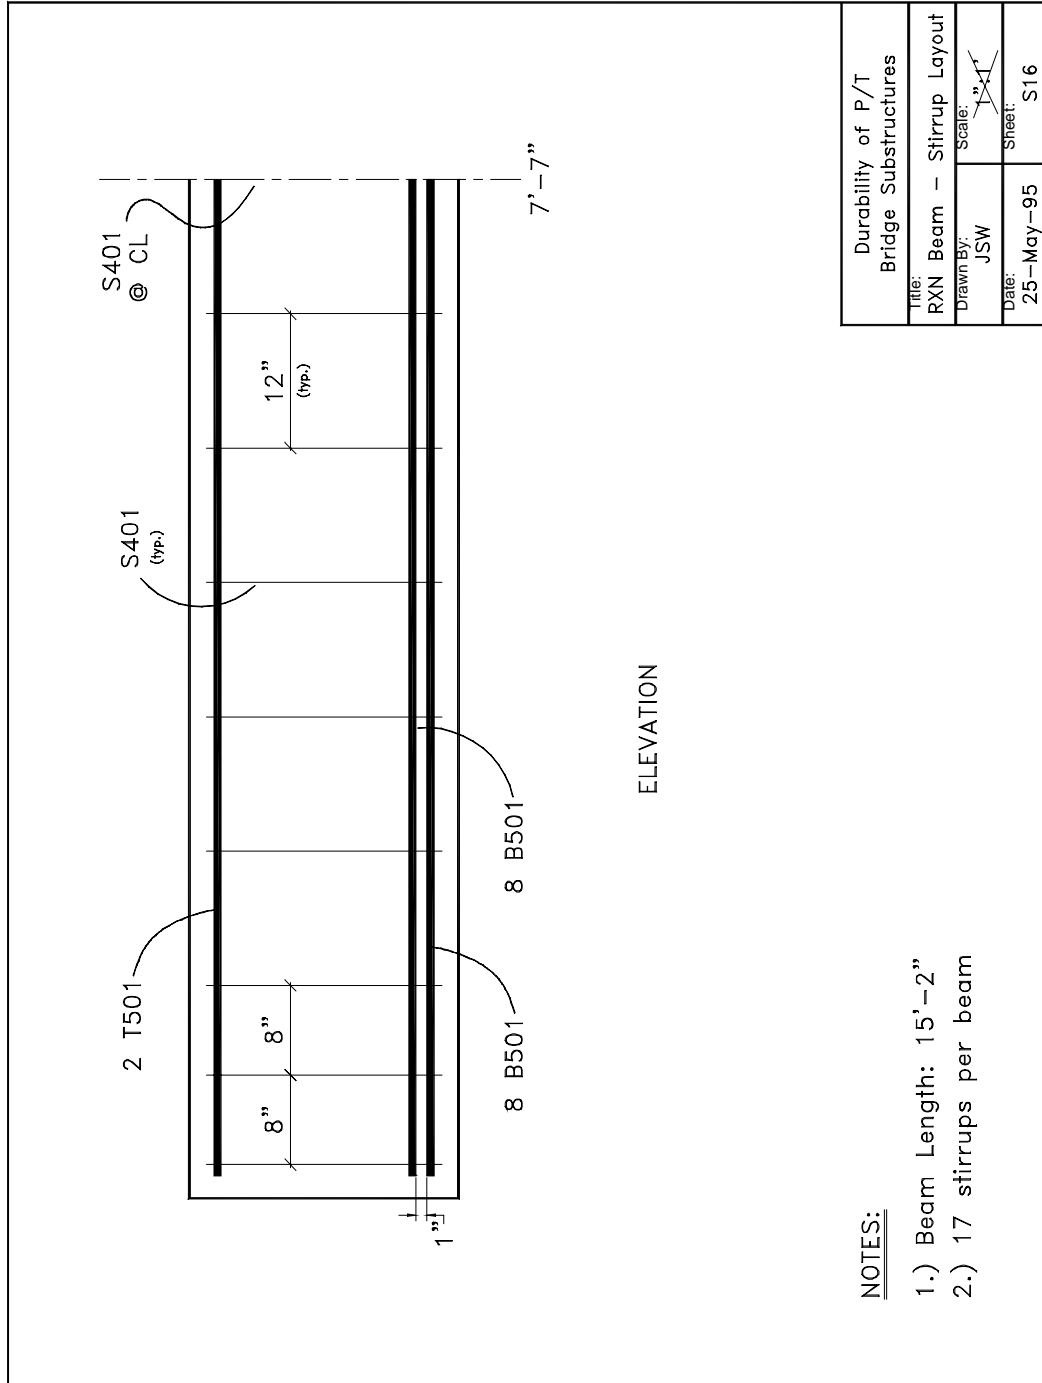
Sheet S16: Reaction Beam Stirrup Layout
